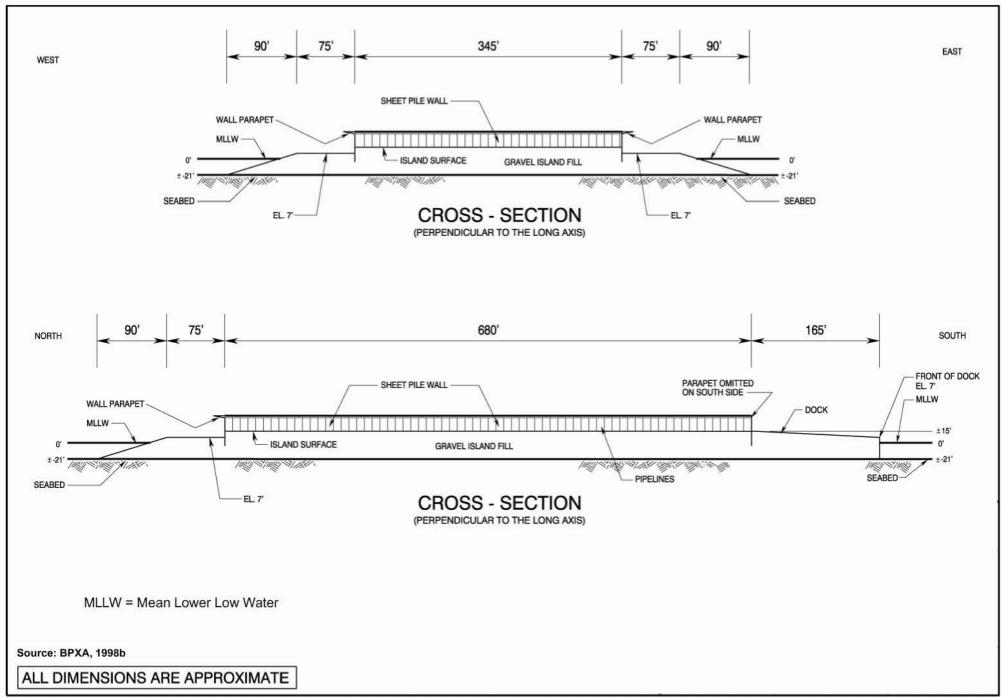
Liberty Development Project: Sheet Pile Island (Alternative IV), Cross Sections
